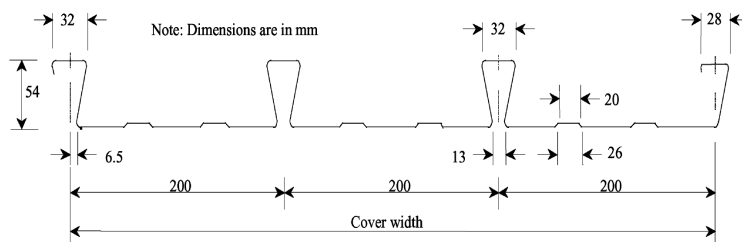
Cross-sectional Dimension of Bondek II Sheet.
